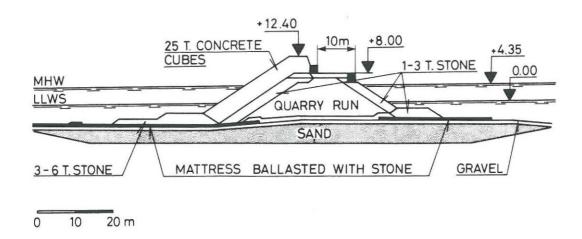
Typical cross section of outer breakwaters Zeebrugge, Belgium.
